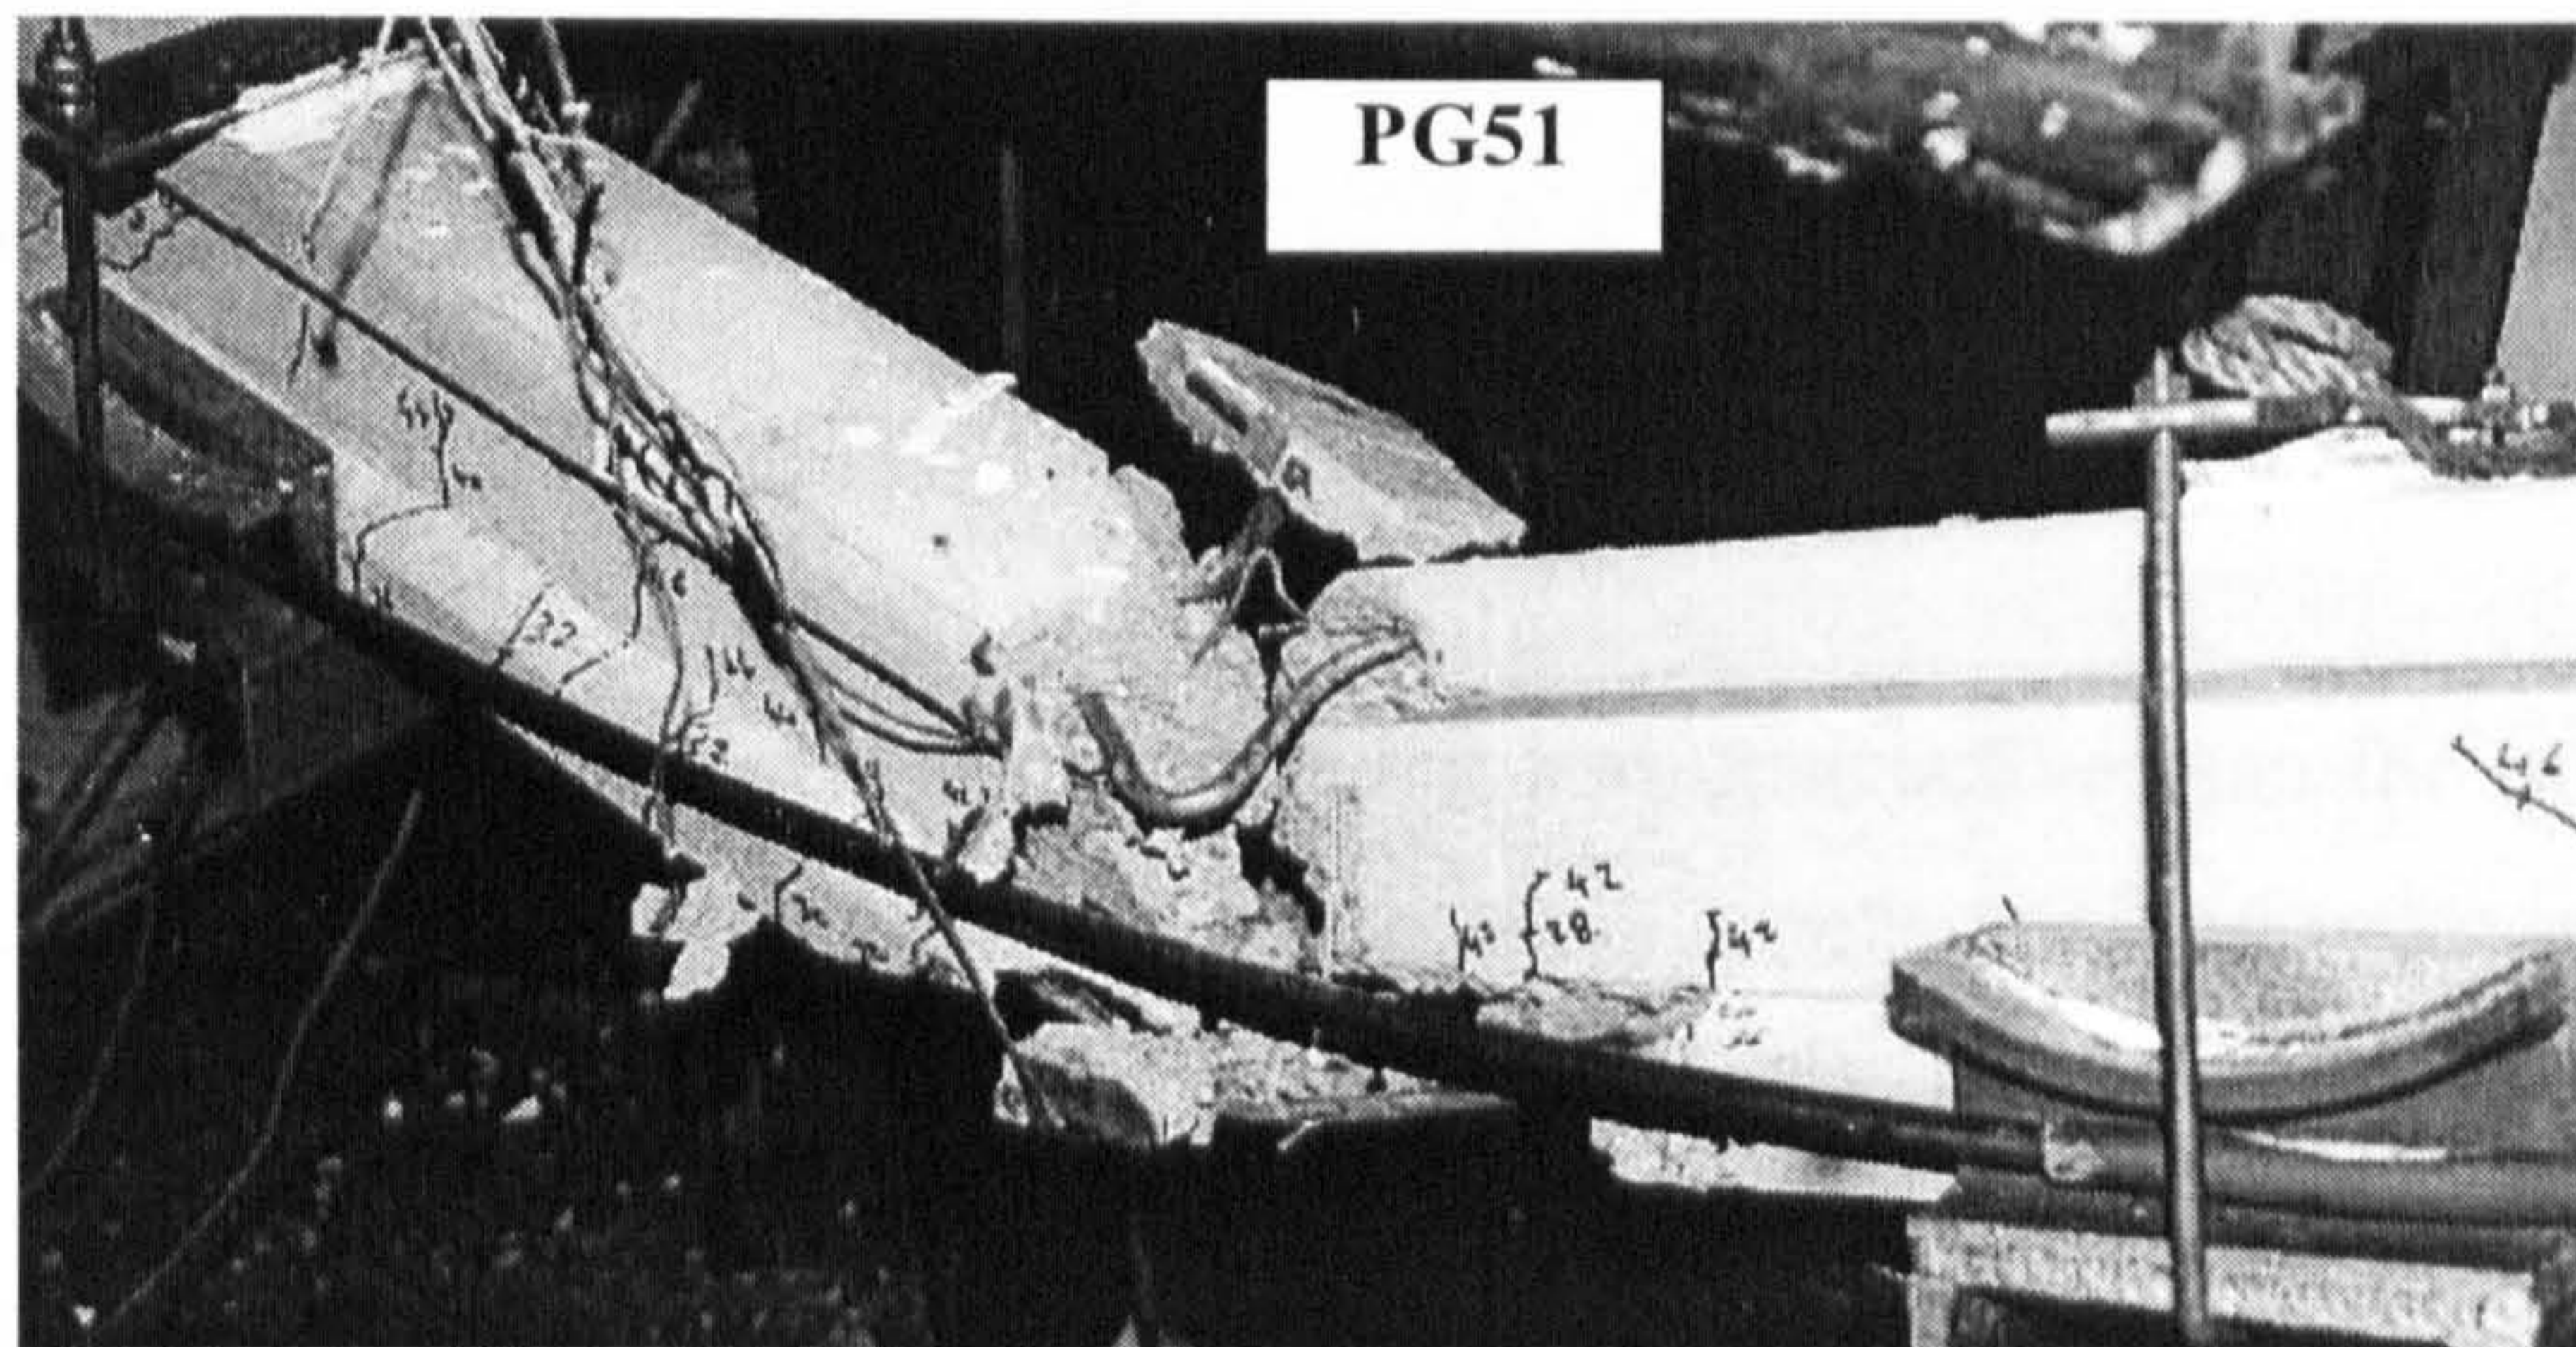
Close-up of flexural failure of external prestressed concrete beam
